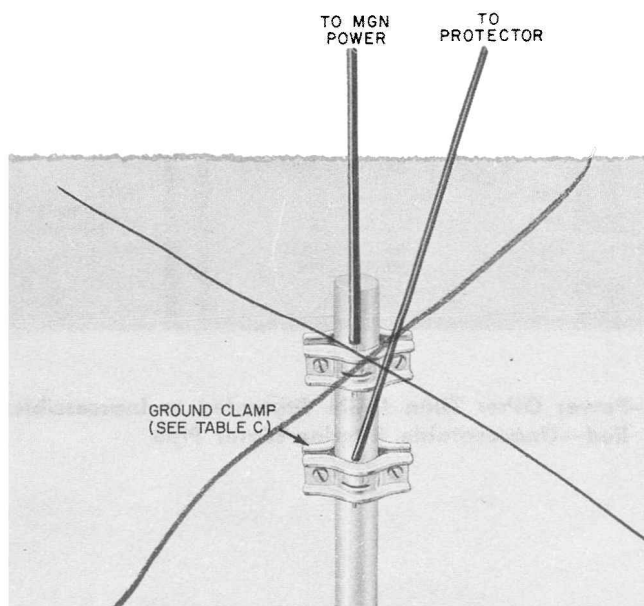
MGN Power Grounded to Ground Rod—No Water Pipe—Connection to Pipe Not Possible
